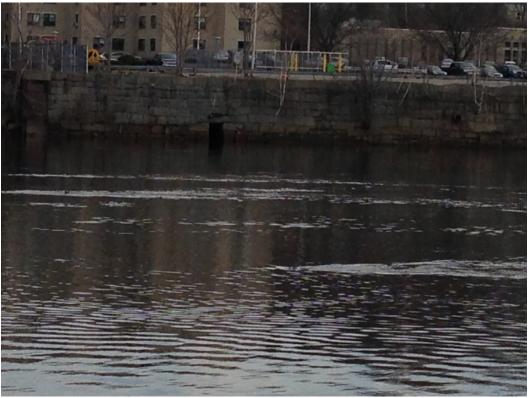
4/8/13 8:36 am View facing north from Crescent Yacht Club of unknown outfalls along north wall of Merrimack near intersection of Chestnut and River Streets.
